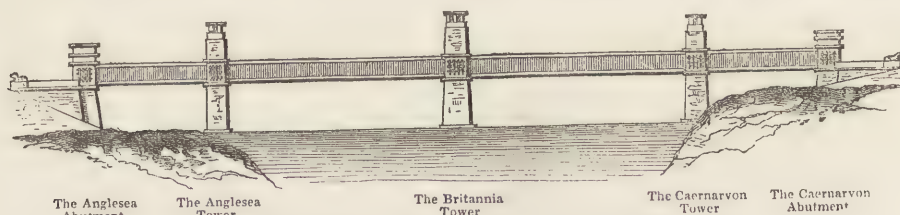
ELEVATION OF THE BRITANNIA TUBULAR BRIDGE.
